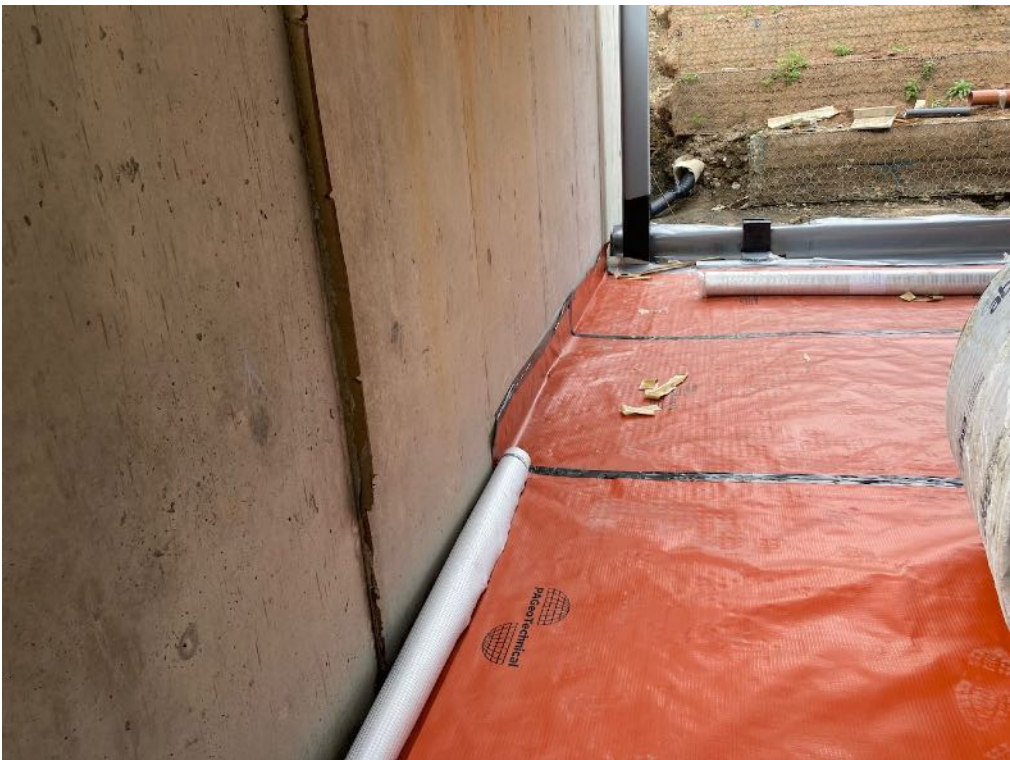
Gas membrane lapped over onto retaining wall (16/08/2021)
